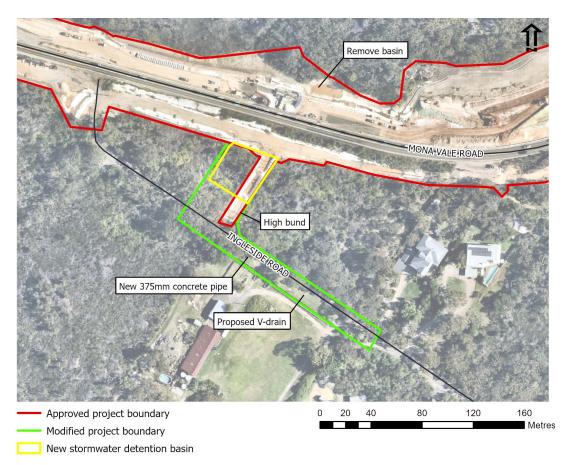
Proposed new permanent stormwater detention basin and associated drainage works
